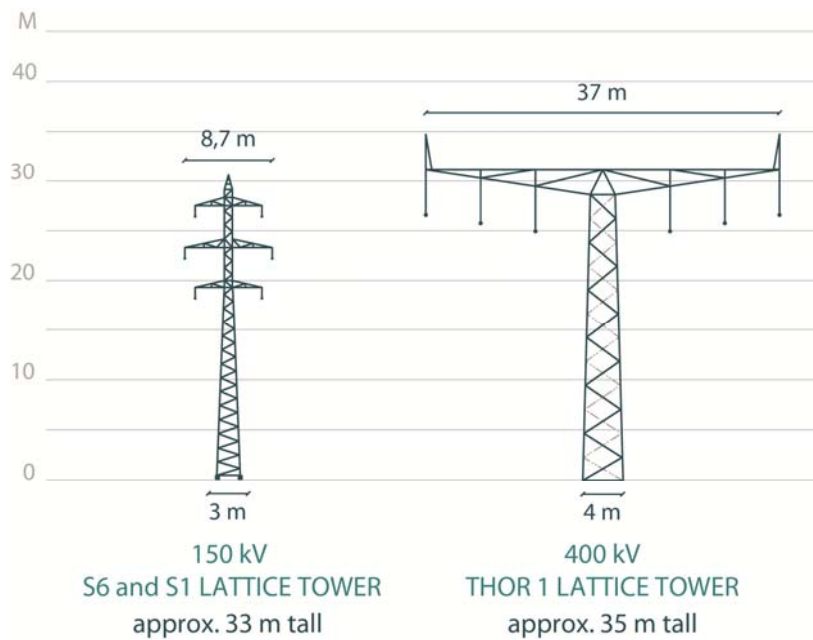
Left: Existing 150 kV OHL tower design between Endrup and Idomlund.
